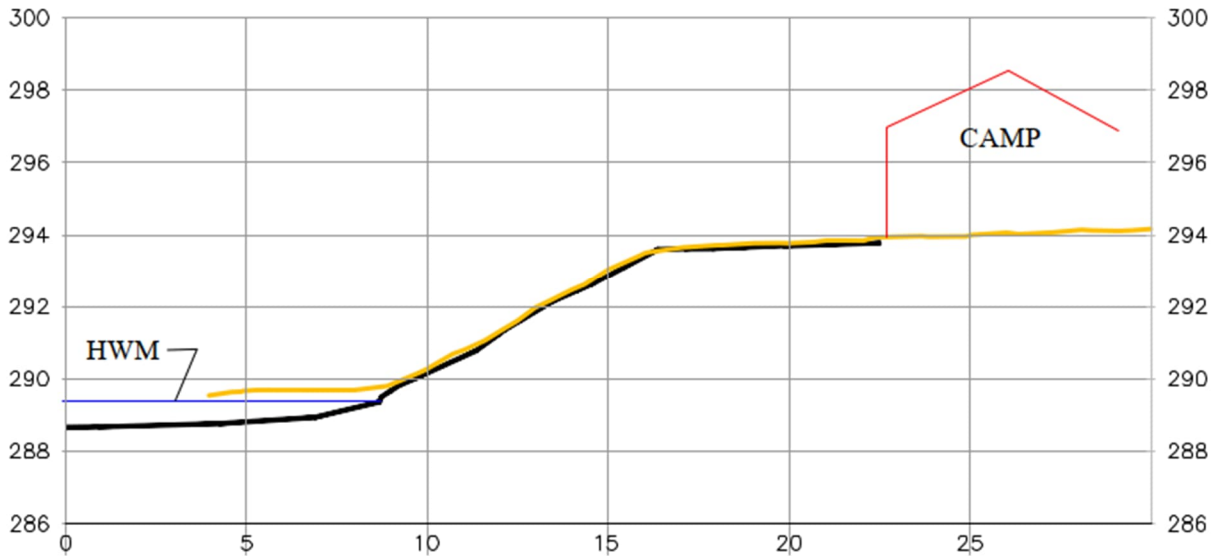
Survey Section 1 through the lower slope leading to the lake shore.
